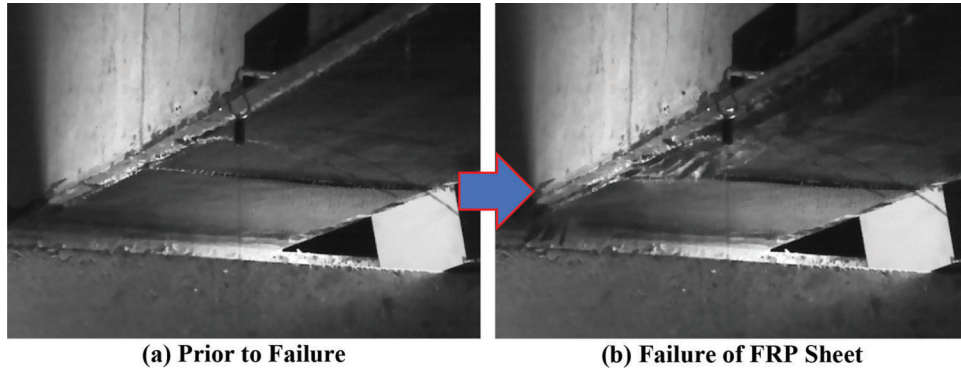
FRP sheet failure at anchor point (Specimen 1-EB.2).
